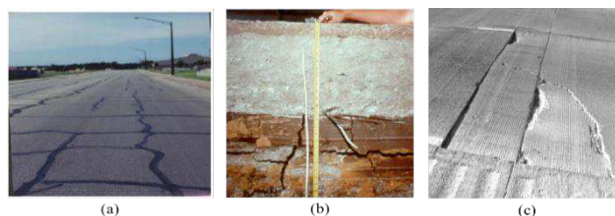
Some Performance issues with CBLS: (a) Block cracking (Scullion 2002), (b) Dry-land cracking (Scullion et al. 2003) and (c) Concrete pavement cracking (Jung et al. 2009).
